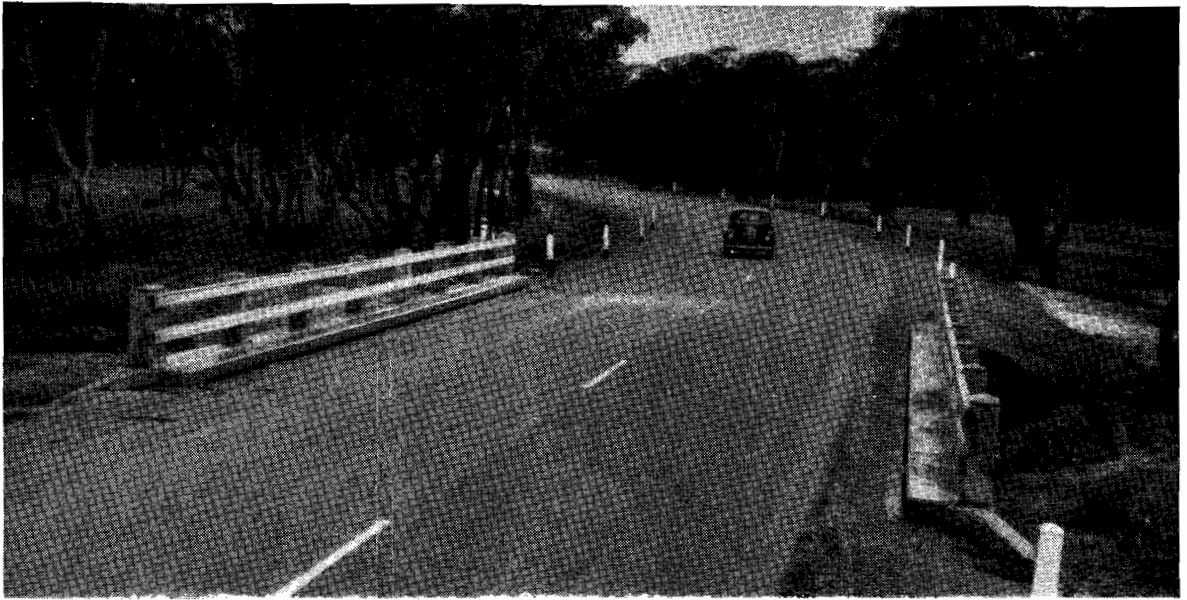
Bridge on North-Western Highway, approximately 136 miles.
